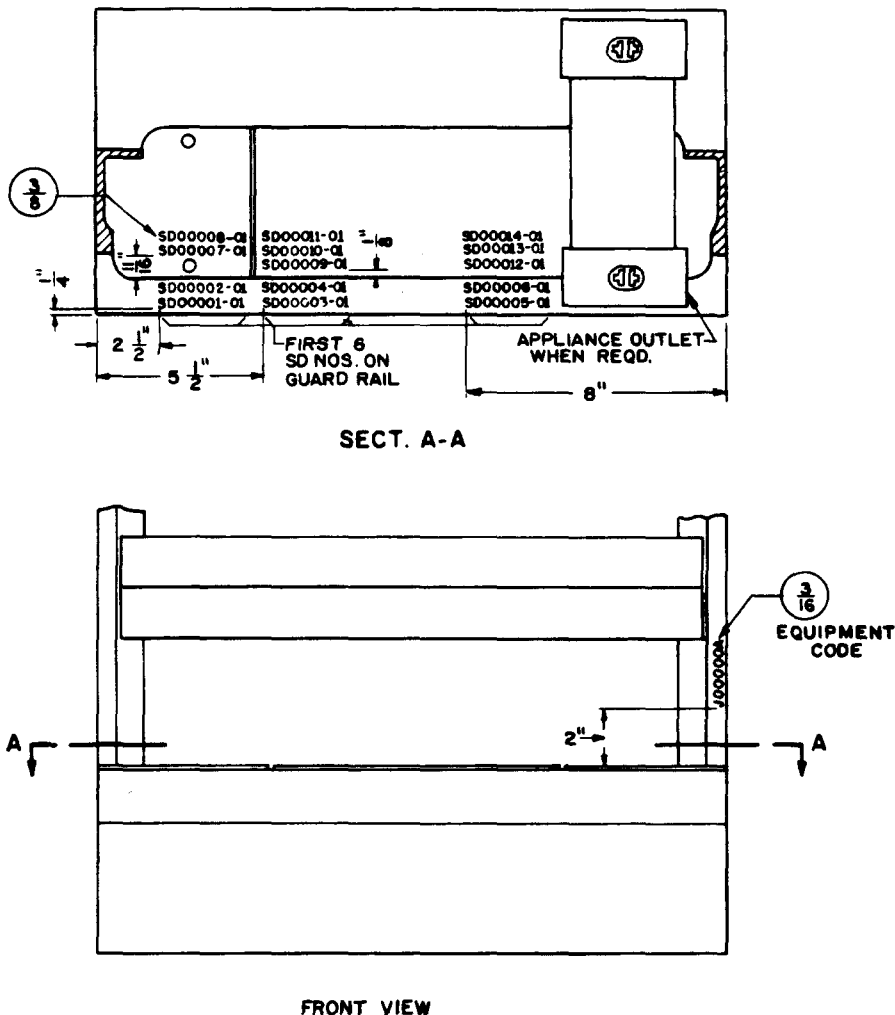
SD Drawing Number and Equipment Code Designation for Frames With Bulb-angle Uprights and Sheet Metal Base - Single Bay or Left Bay of 2-bay Frame
